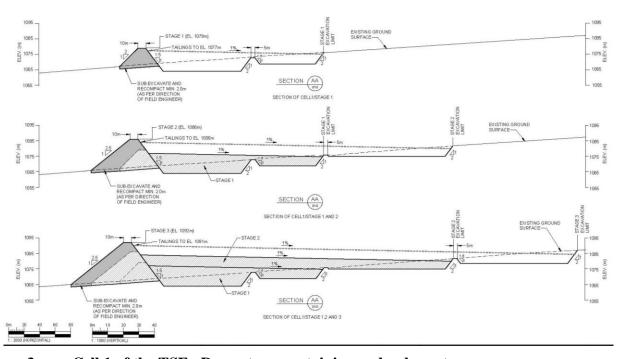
Cell 1 of the TSF - Downstream retaining embankment
